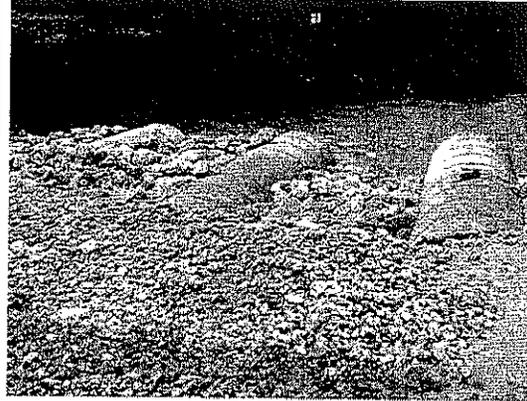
Partial failure of Indian Creek crossing at Sta. 189+50
